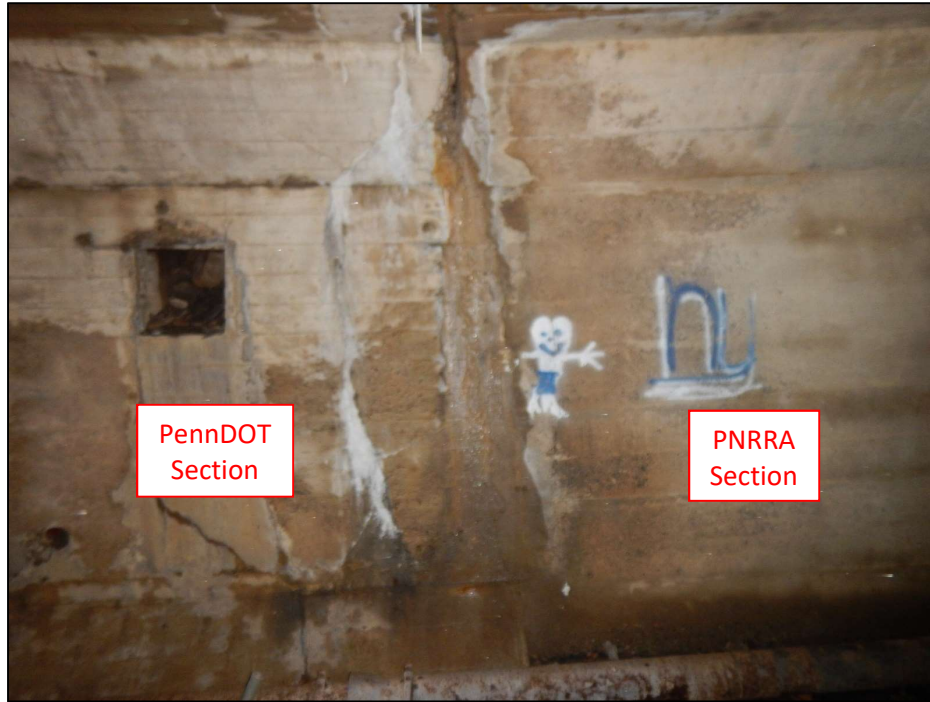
Span 2 north wall construction joint between the sections with active water seepage and efflorescence.
